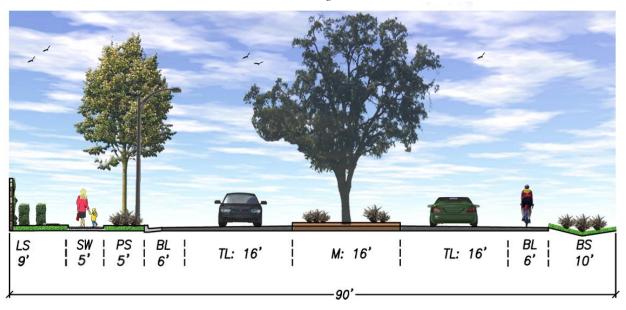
(continued) Arterial Roadway Geometrics and Access Restrictions
